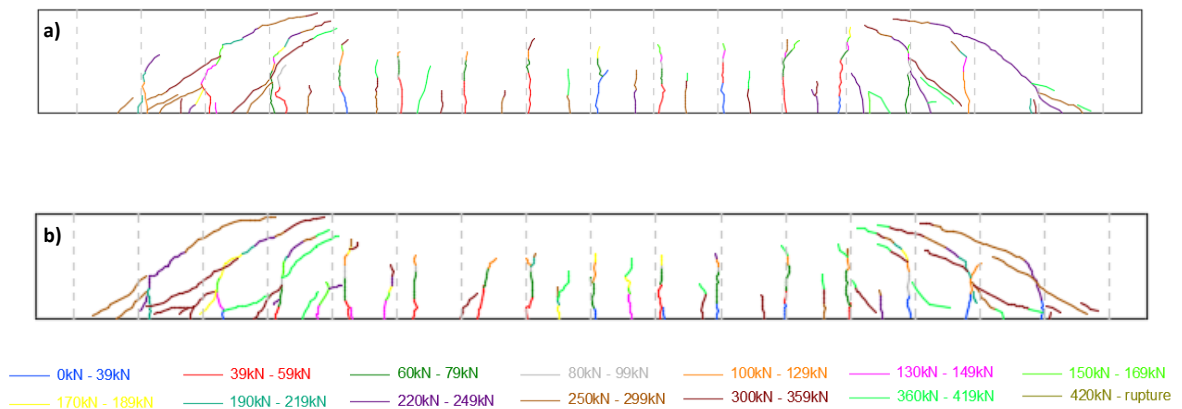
Cracking pattern at failure: a) BS250; b) BC250
